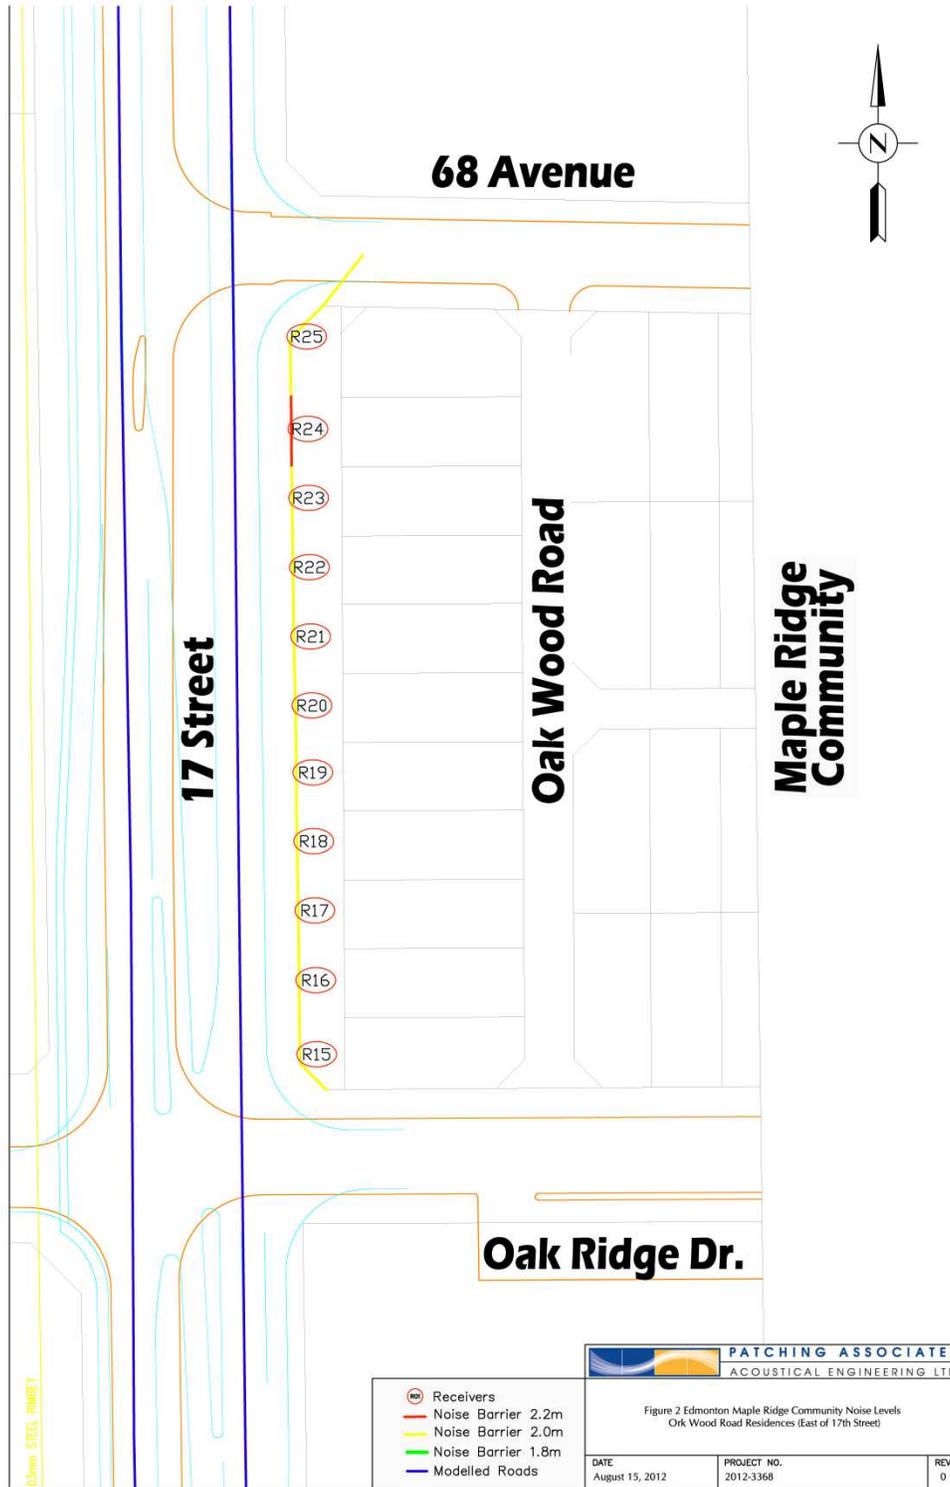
Barrier Design Study for the Proposed 17th Street Widening
